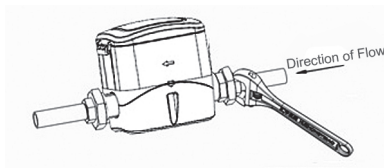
Meter Mounting Diagrammatic Sketch 2
